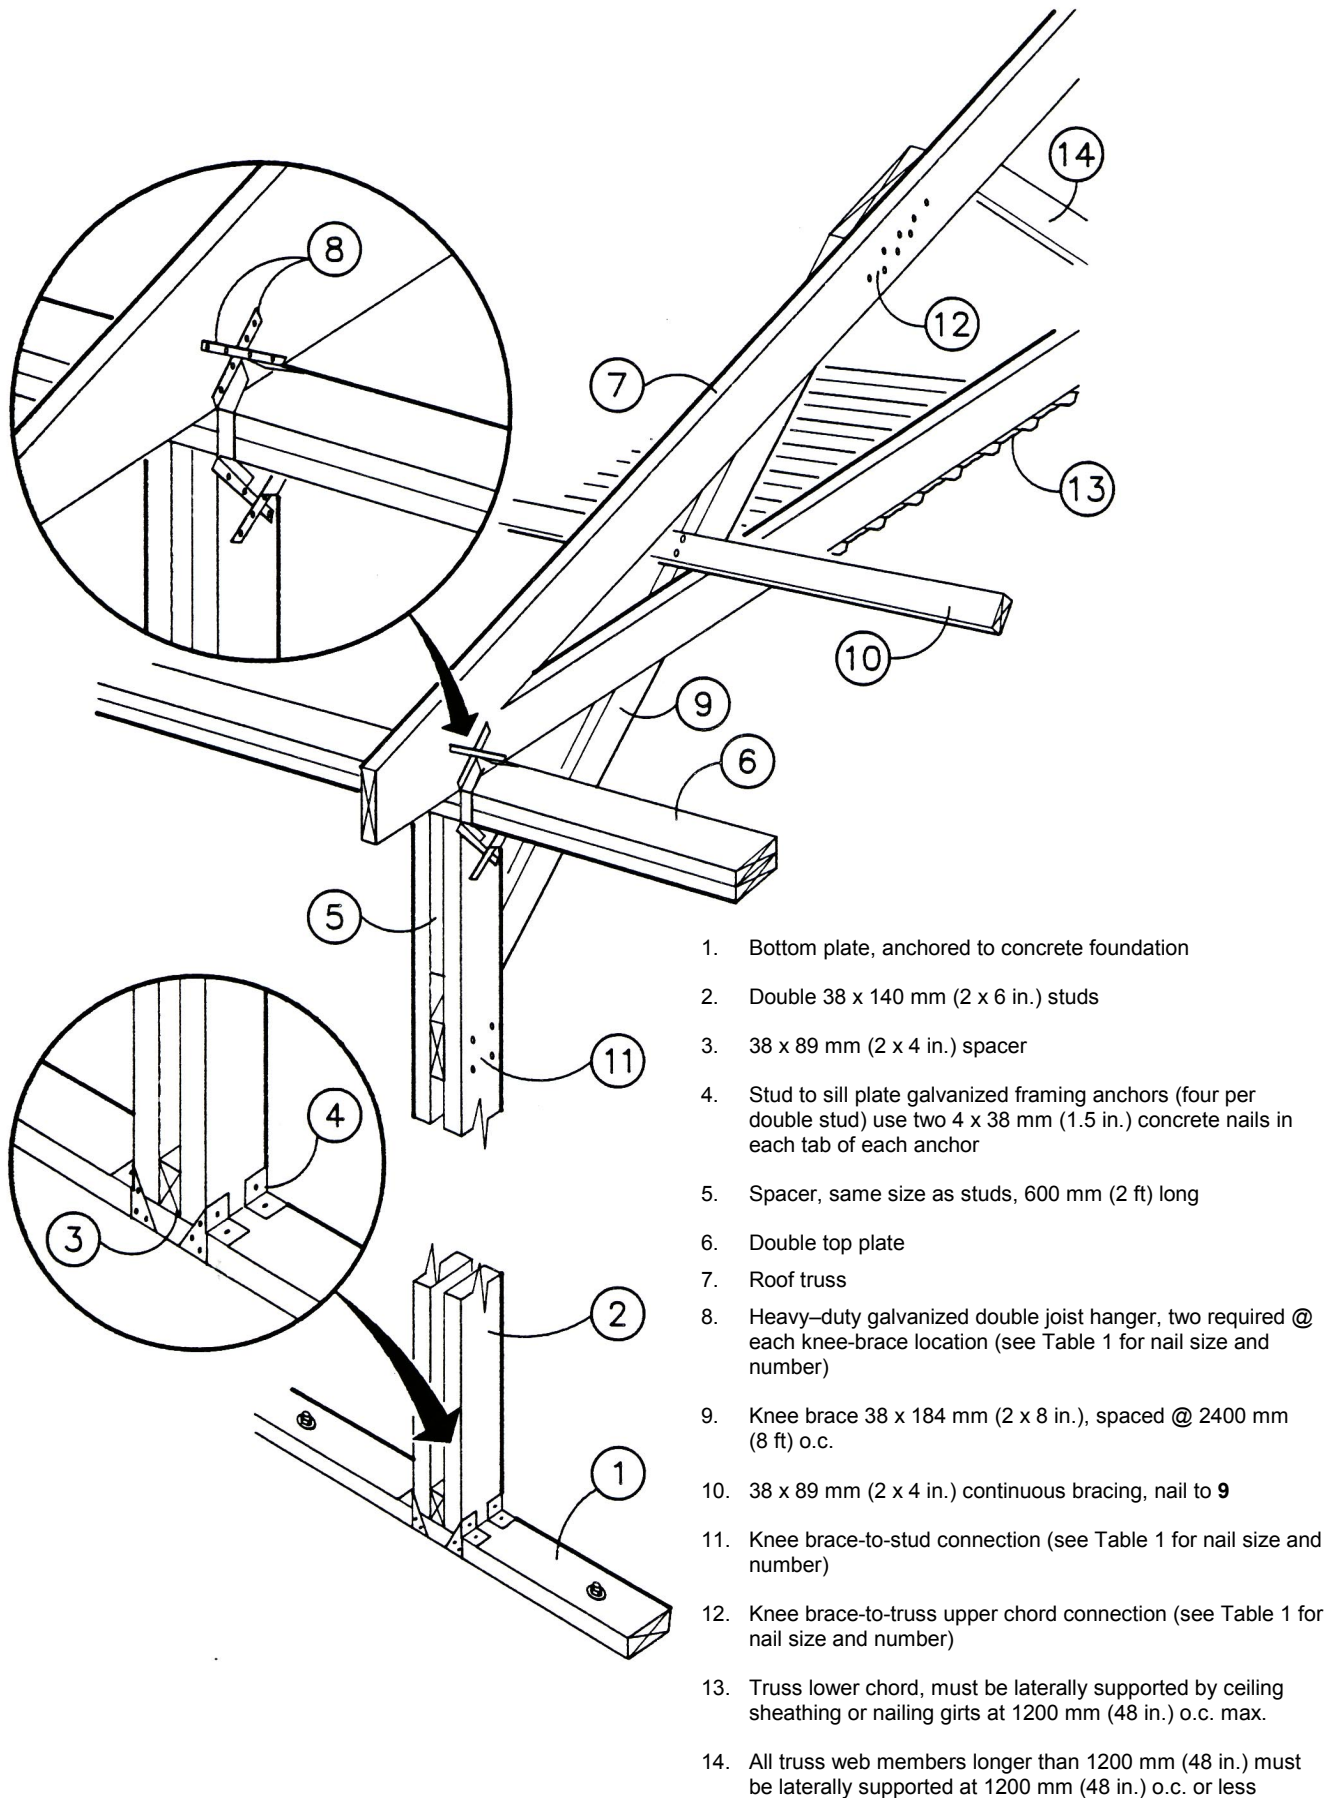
LIGHT DUTY KNEE-BRACES FOR STUD WALLS
